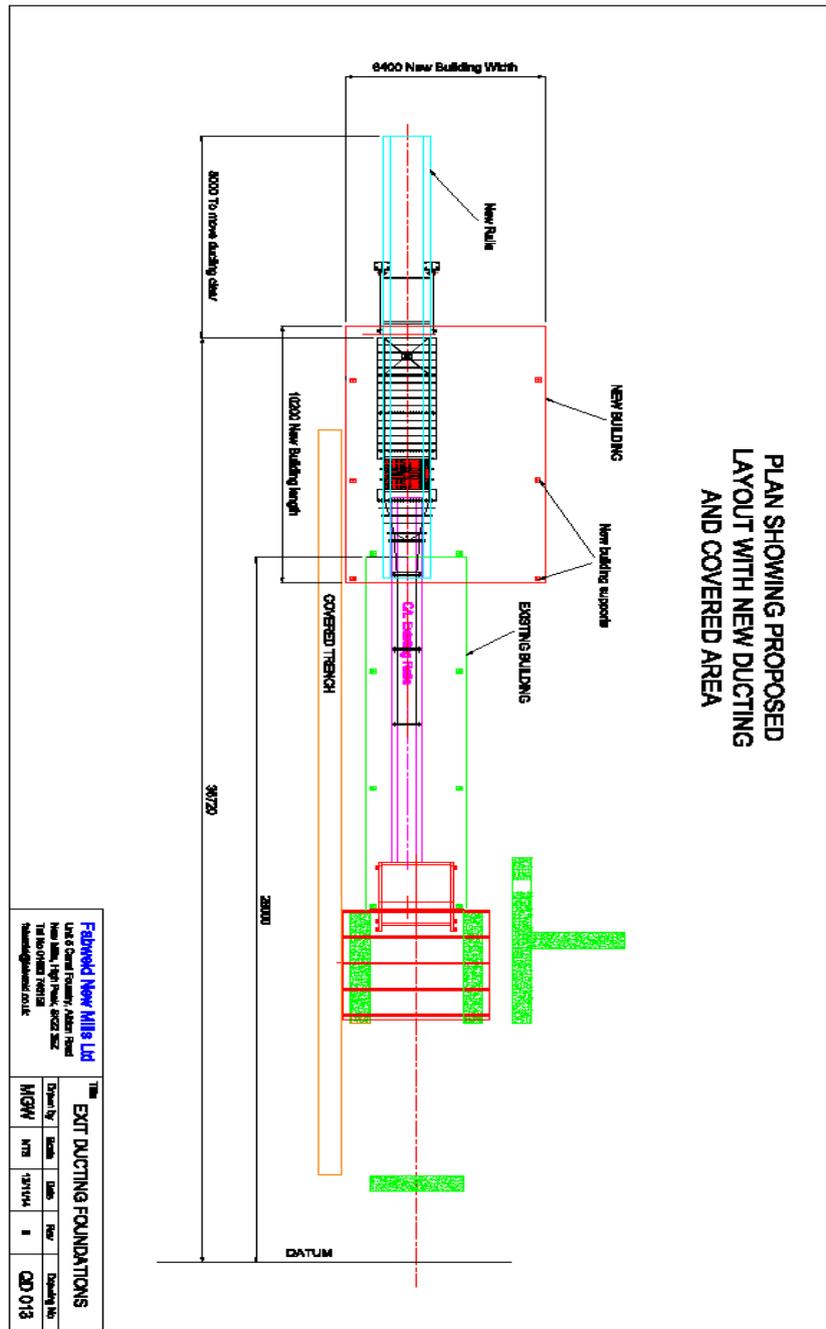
Plan view showing proposed layout of the HRSG rig and enclosure.
